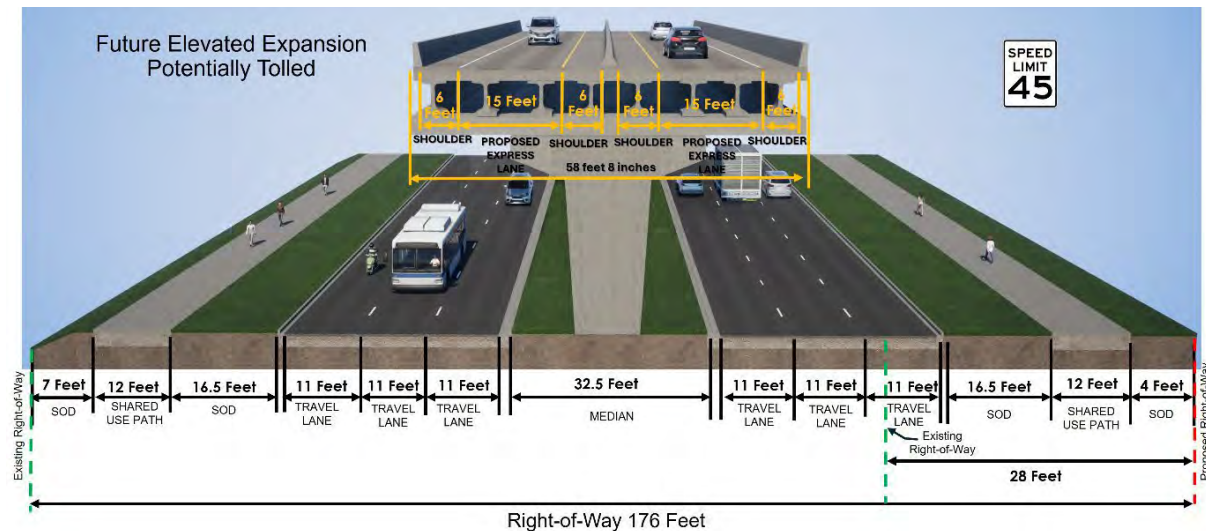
Preferred Roadway Typical Section: North of Desoto Bridge
